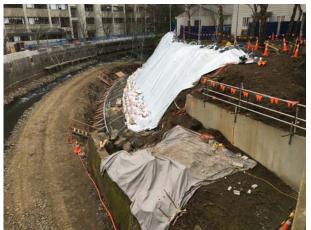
Leith Flood Protection Scheme works underway on left bank between Union Street and Leith Footbridge on 24 August 2017
